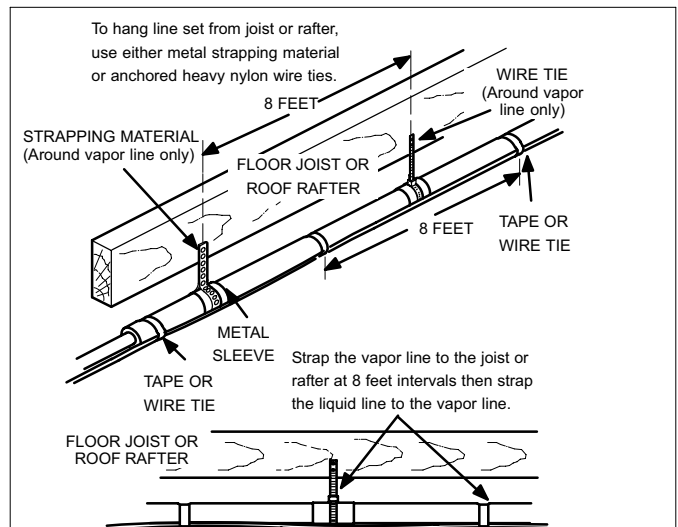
Refrigerant Line Sets: Installing Horizontal Runs
